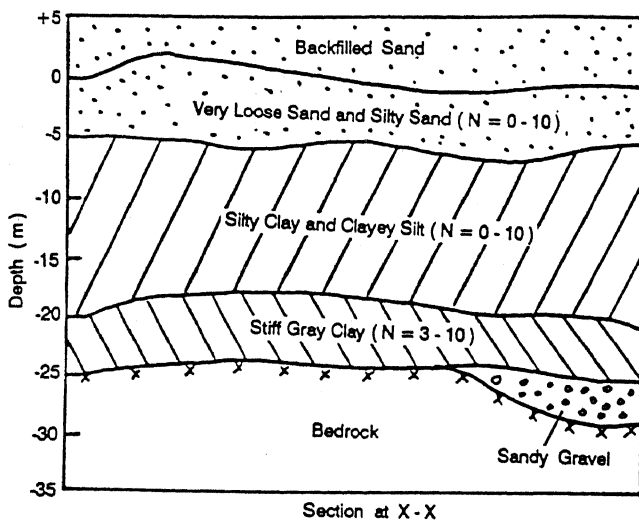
Typical soil profiles with N-values along the cross section X-X in Fig. 1
